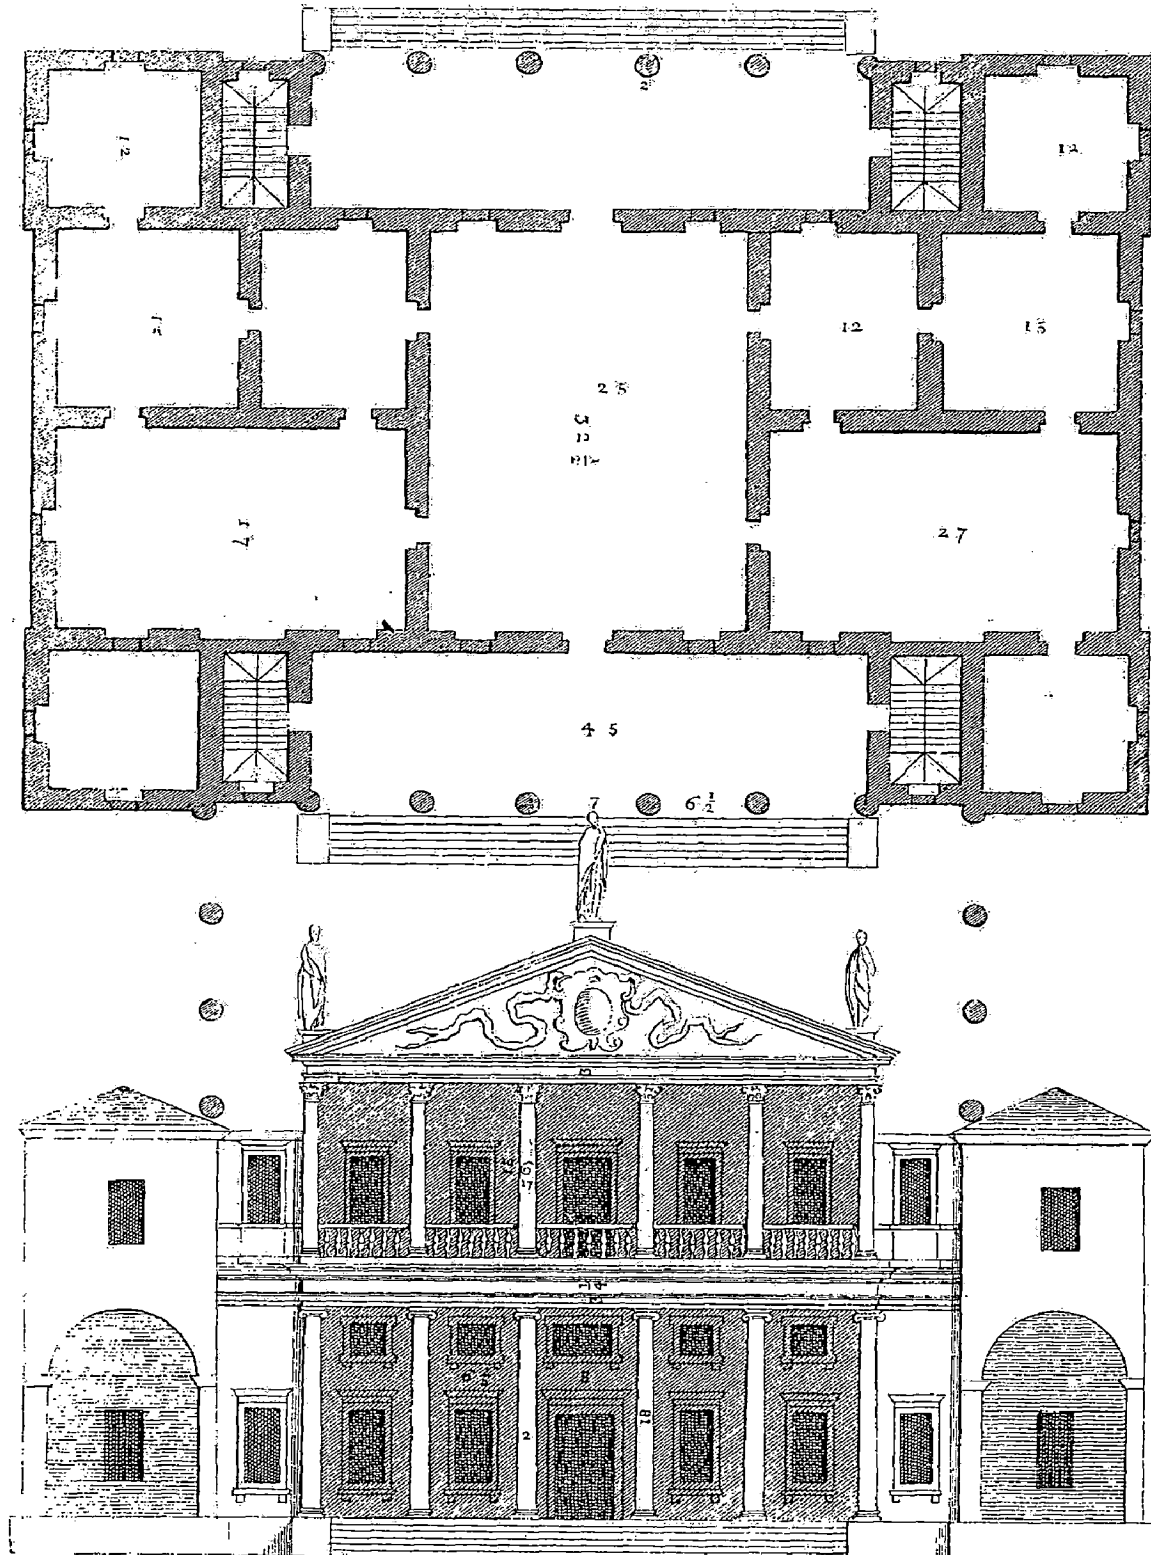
Villa Francesco Valmarana at Lisiera in plan and elevation
